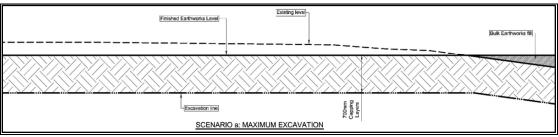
Maximum excavation scenario (source: Walters, 2020)
